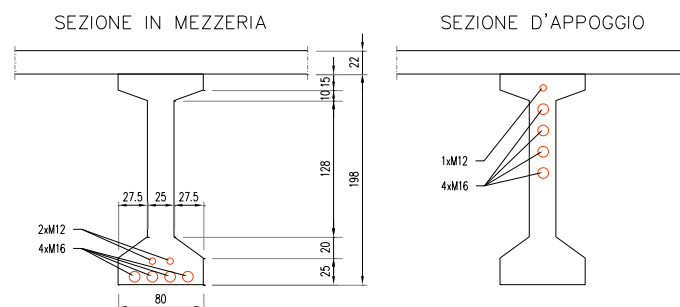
Main girder cross section and prestressing cables / Sezione trasversale e cavi di precompressione delle travi principali.
